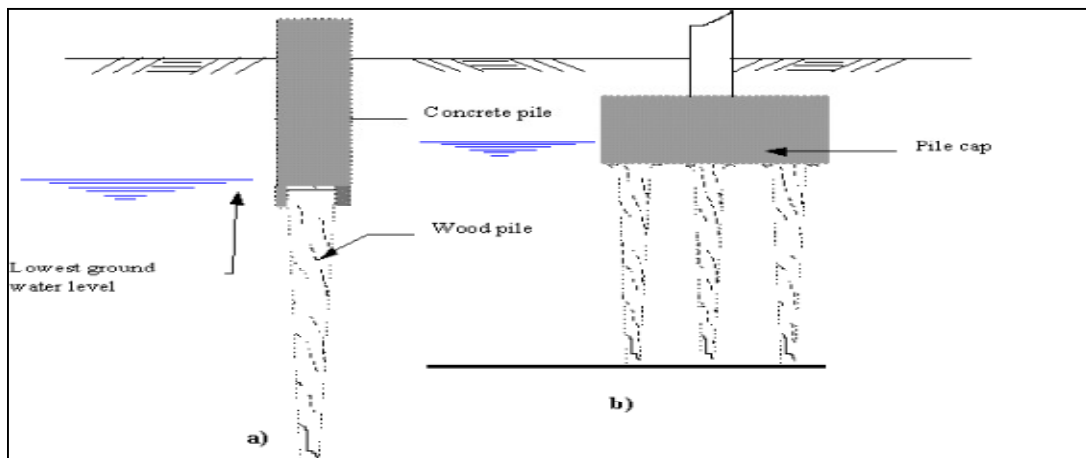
2 Protecting timber piles from decay. a) By pre-cast concrete upper section above water level. b) By extending pile cap below water level. (36)
